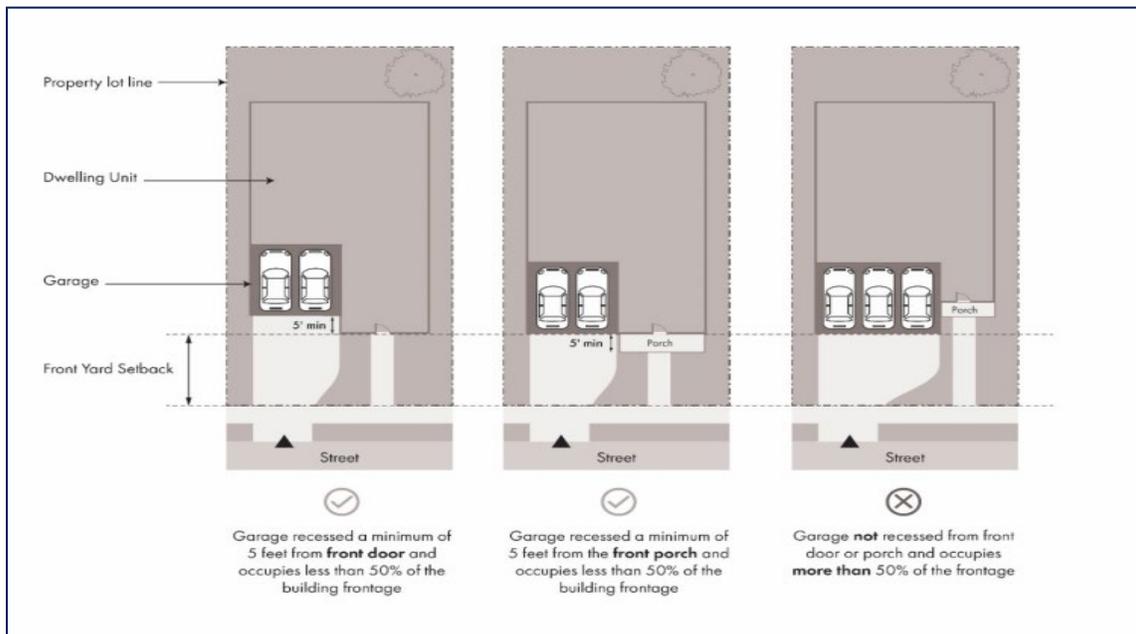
FIGURE: IF A GARAGE DOOR FACES THE STREET, THE FRONT PLANE OF THE GARAGE SHALL BE SETBACK FROM THE FRONT PORCH OR PATIO AND OCCUPY NO MORE THAN 50% OF THE BUILDING FRONTAGE
